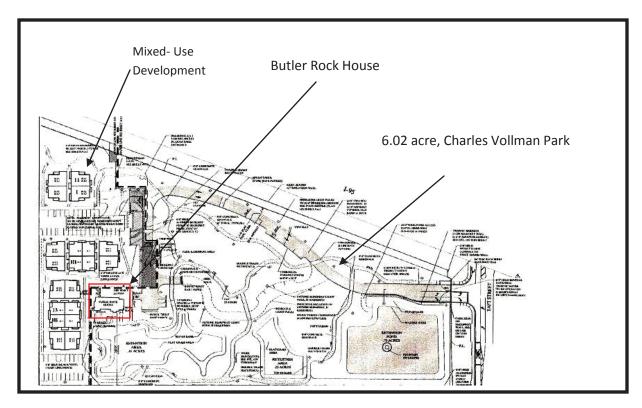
Site Plan with Mixed-Use Development and Butler House location
